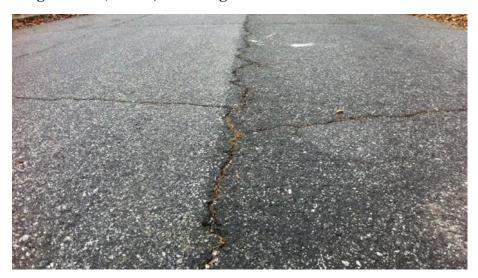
Longitudinal (linear) cracking (original in colour)
